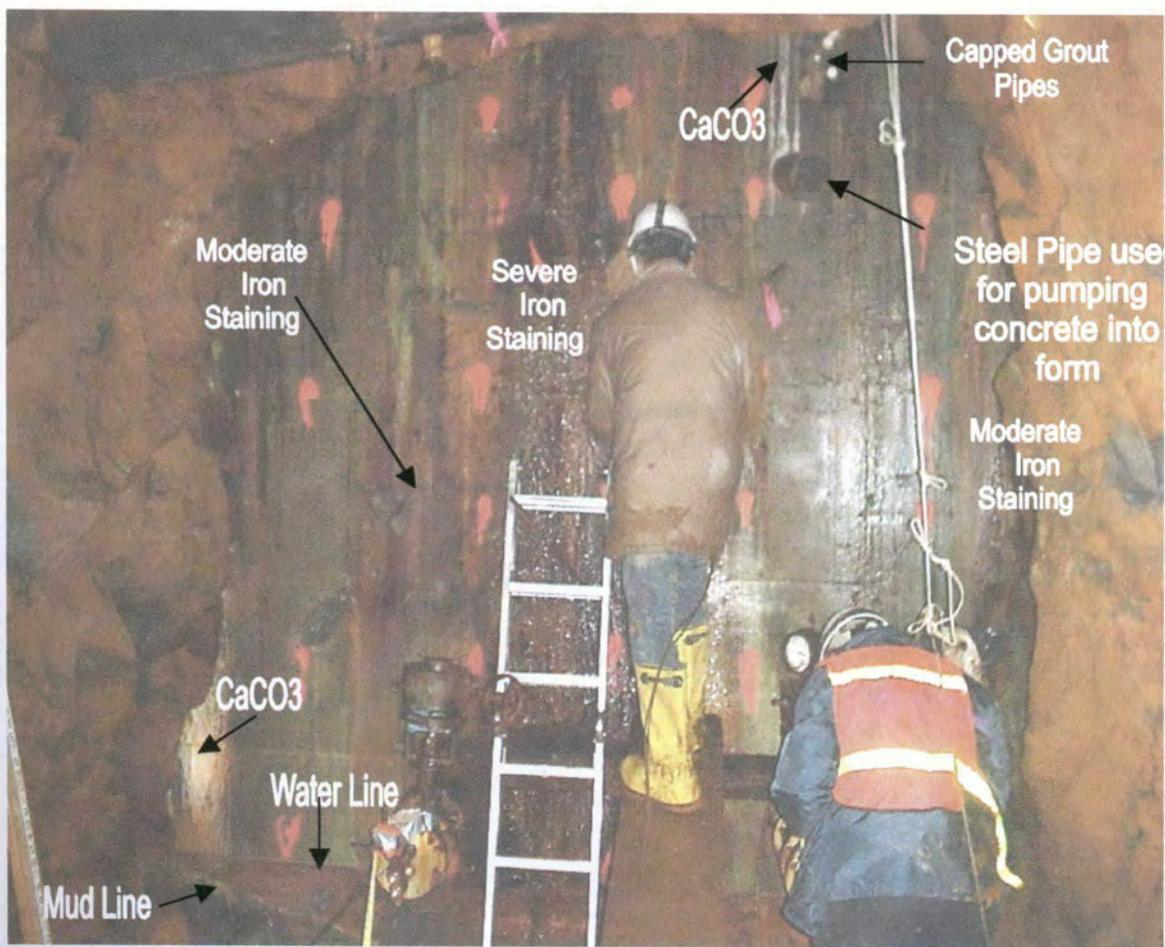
Walker Mine Concrete Seal (November 1, 2000). Red paint marks are impact points for nondestructive testing.
